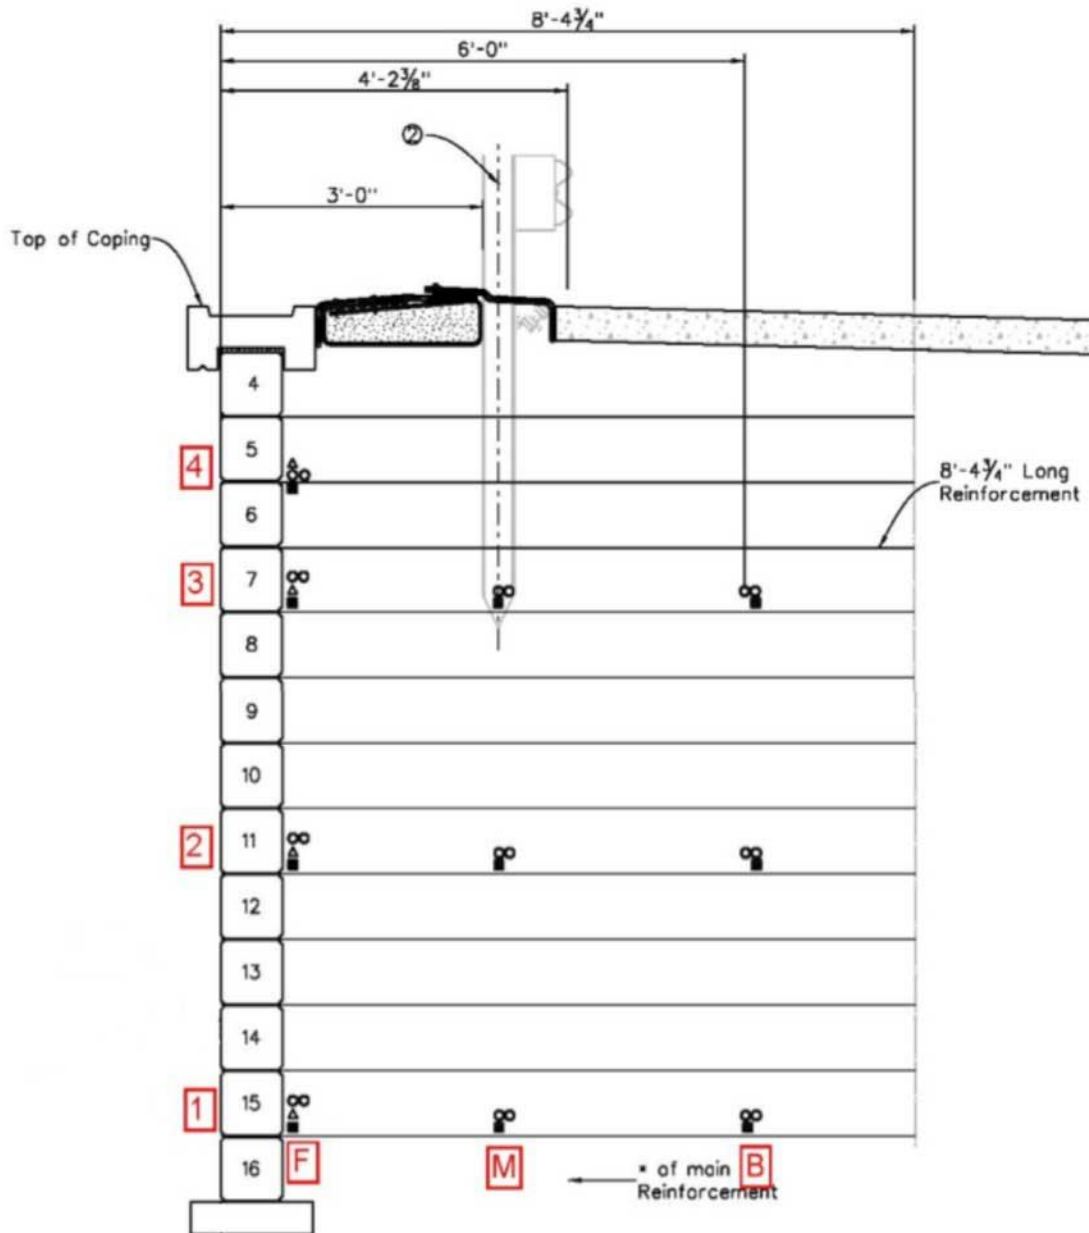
Section at Instrumentation Line 4 (drawing provided by Shannon and Wilson). As height of the wall must be reduced at various stations, top block courses are removed and instruments at elevation 4 are moved down.
